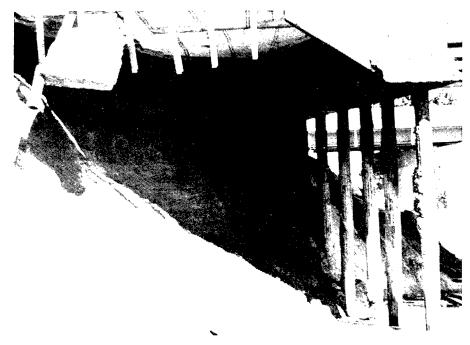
U.S. Highway 54 southwest abutment undermining at intersection with KD Trail, at Jefferson City, Missouri (courtesy of Missouri Highway and Transportation Department).
